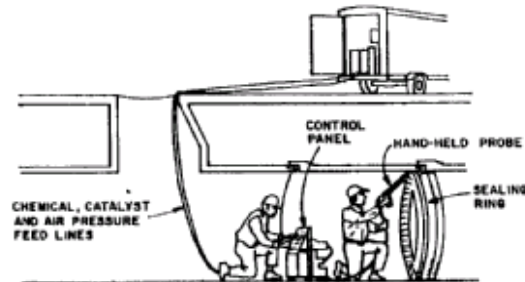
Typical arrangement for sealing large diameter pipe with grouting rings.
